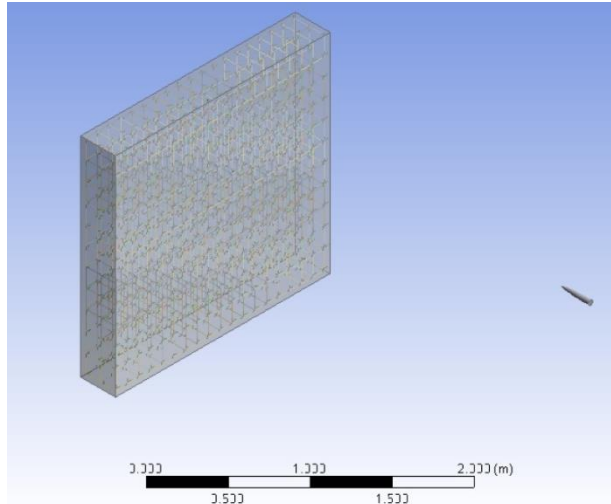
Reinforced Concrete Wall with Fragment due to 59.57 kg TNT Shaped Charge.
